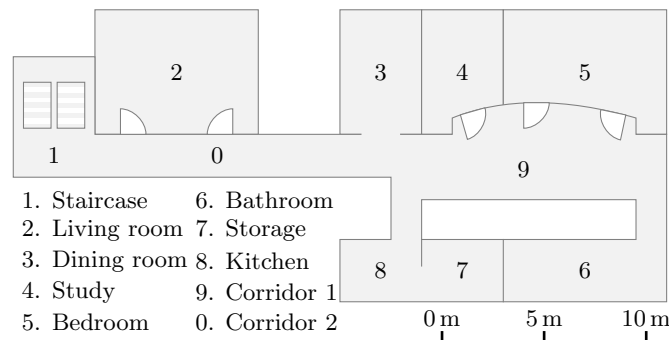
Floor plan of the indoor environment that is considered for calibration and testing of the proposed system.
